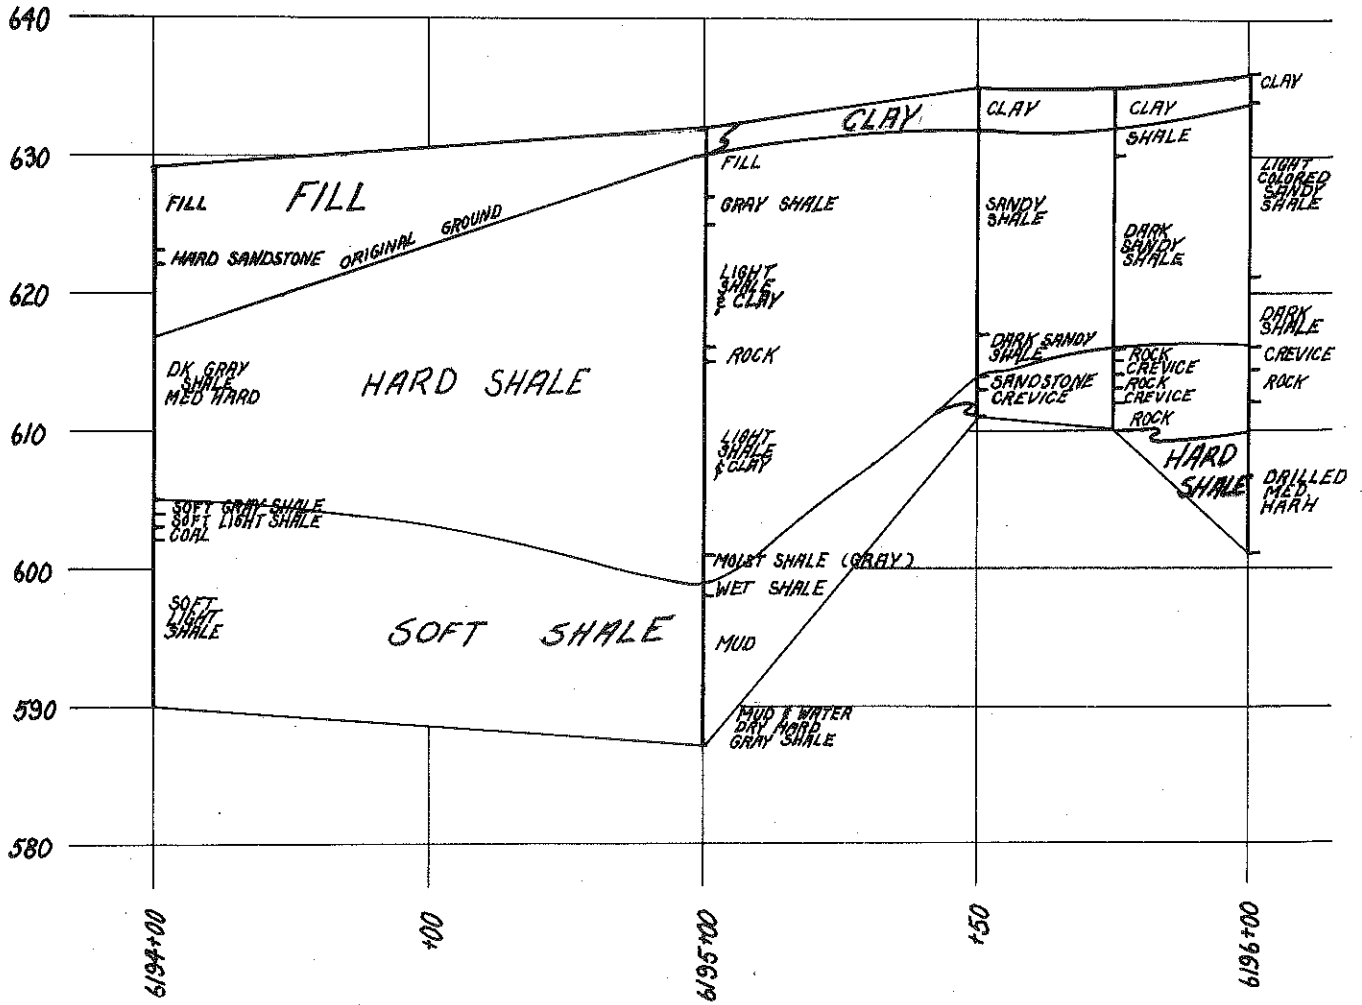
Soil Profile, Centerline, Mile Post 83.
